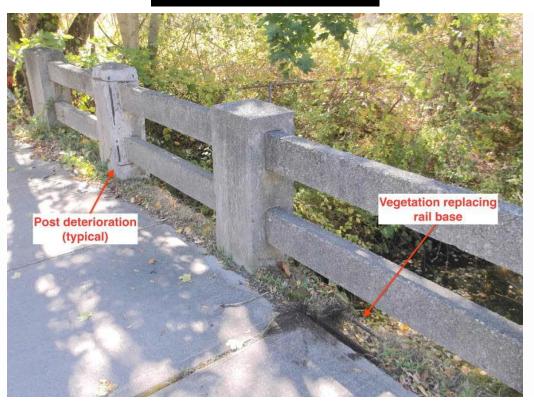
West rail, typical headwall (rail base) and post deterioration.
